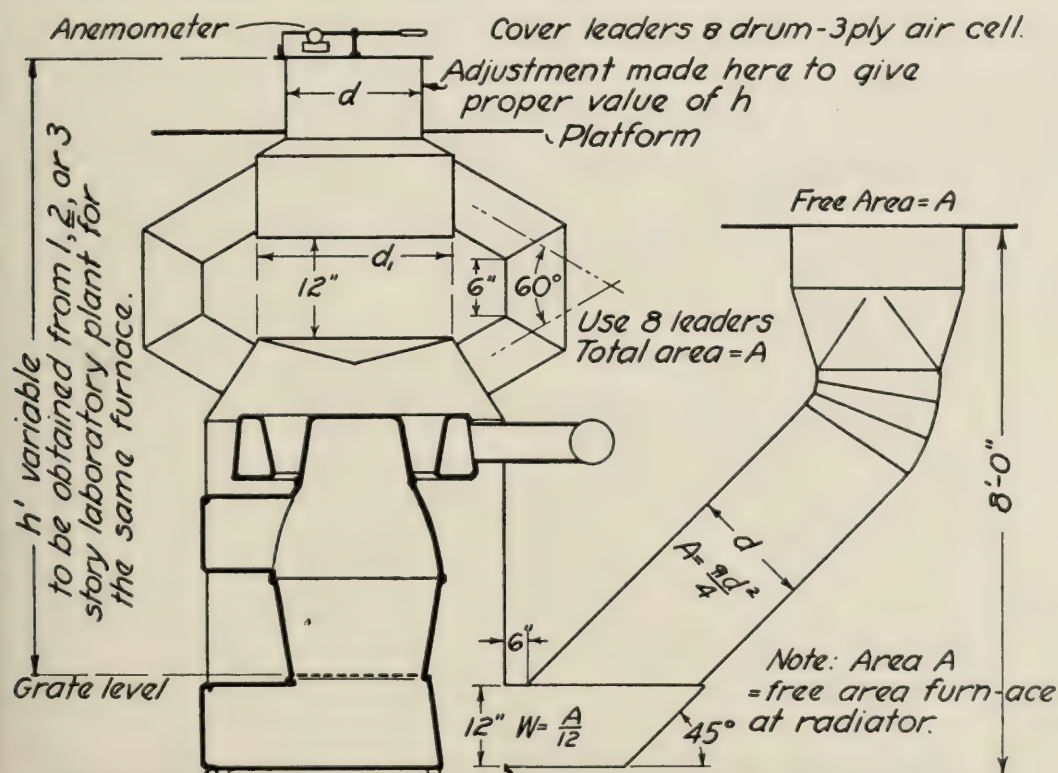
SECTIONAL ELEVATION OF EQUIVALENT TESTING PLANT FOR PIPED FURNACE
